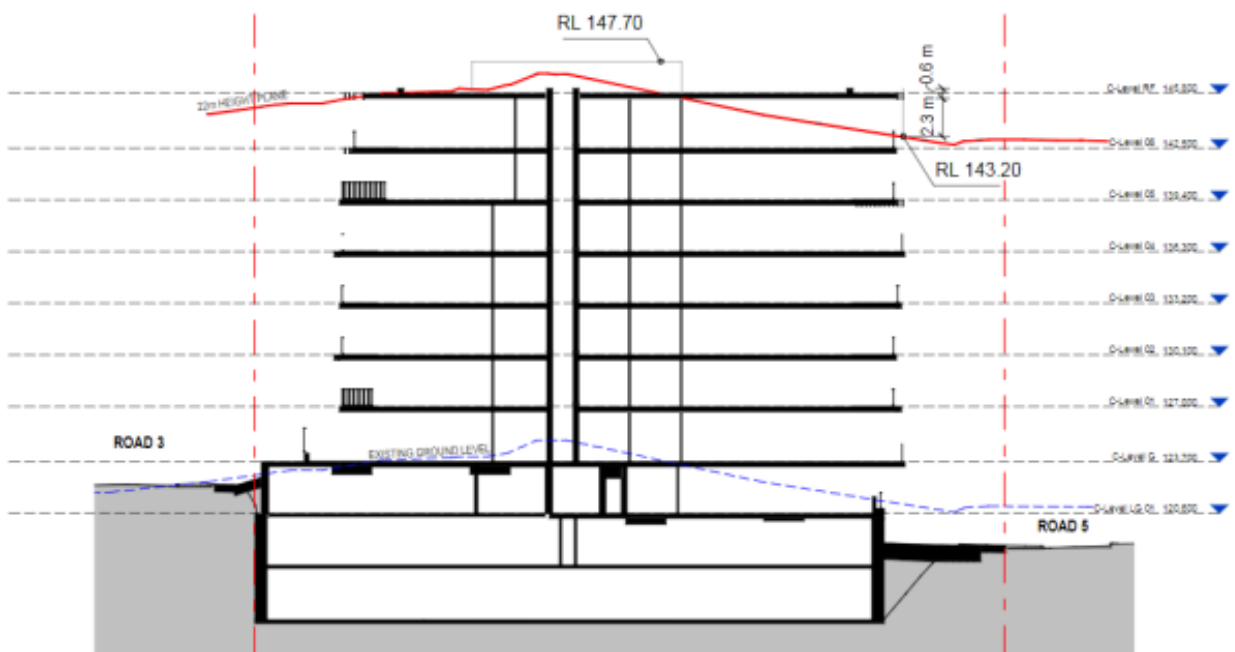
South Section of Building C showing the extent of height contravention (2.9m) (Source: Mirvac Design)
